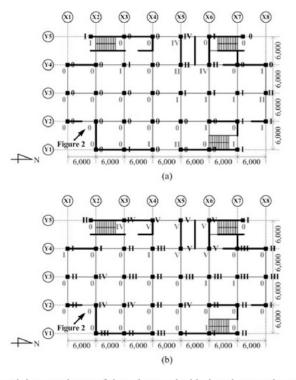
Floor plans and damage classes of the columns; the black and gray colors represent the damage classes (0 through V) in the longitudinal and transverse directions, respectively. (a) Second floor. (b) Third floor.
